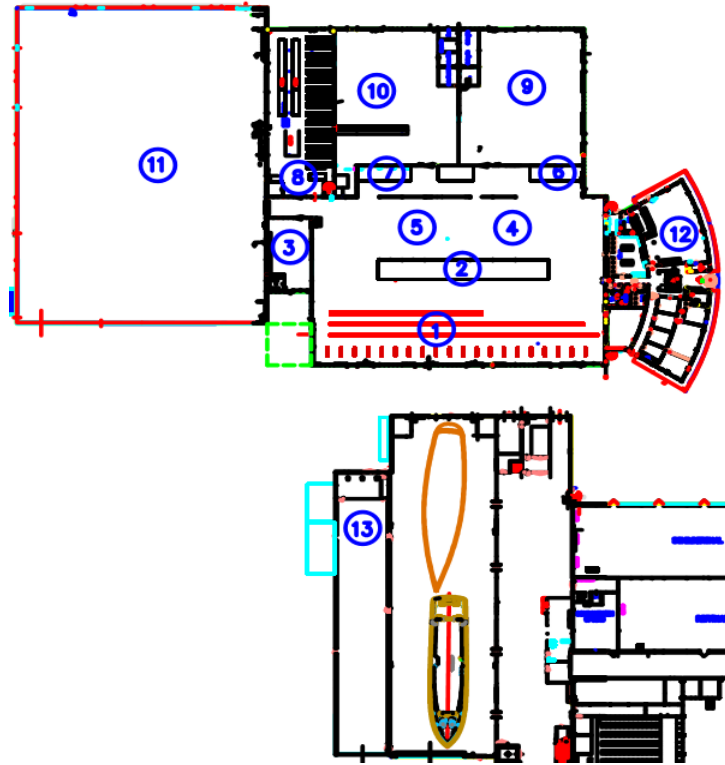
Floor Plan of the Rondal and Royal Huisman Facilities
